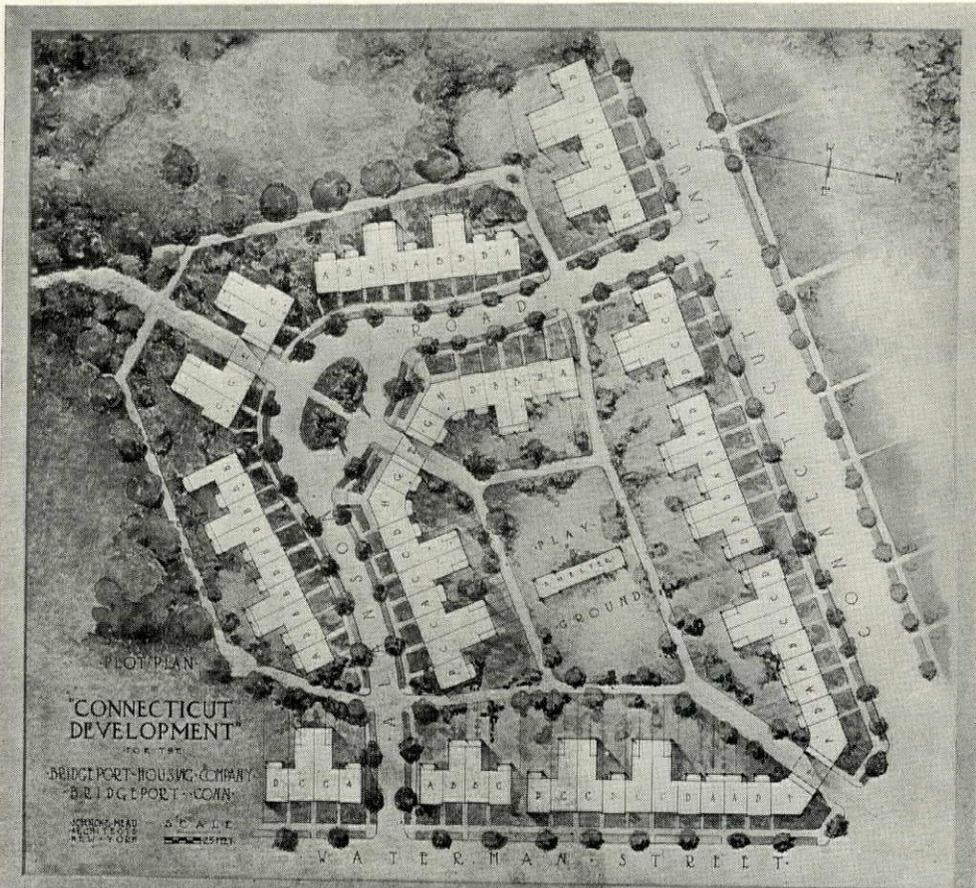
GENERAL PLAN AND TYPE PLANS—BRIDGE-
